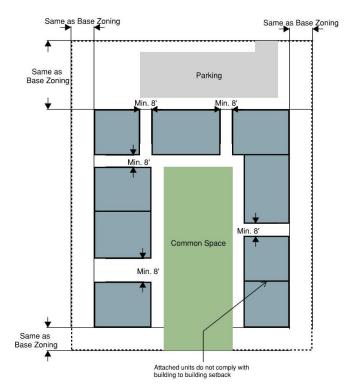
(A)(1): Cottage Setbacks and Building to Building Placement
